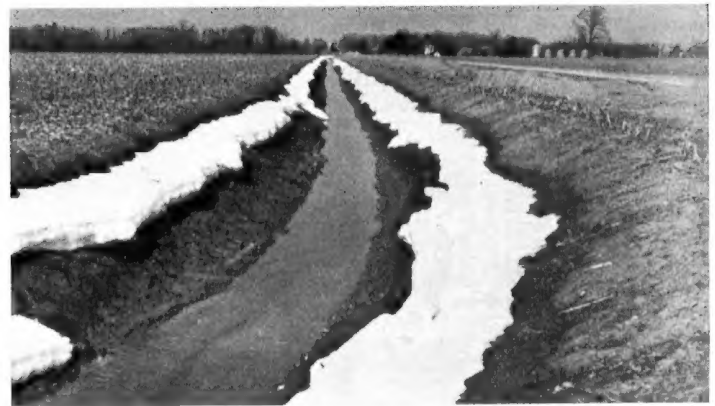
A well-constructed open ditch that provides an outlet for tile and surface drains. The soils are of the Toledo, Hoytville, Latty, and Pewamo series.
